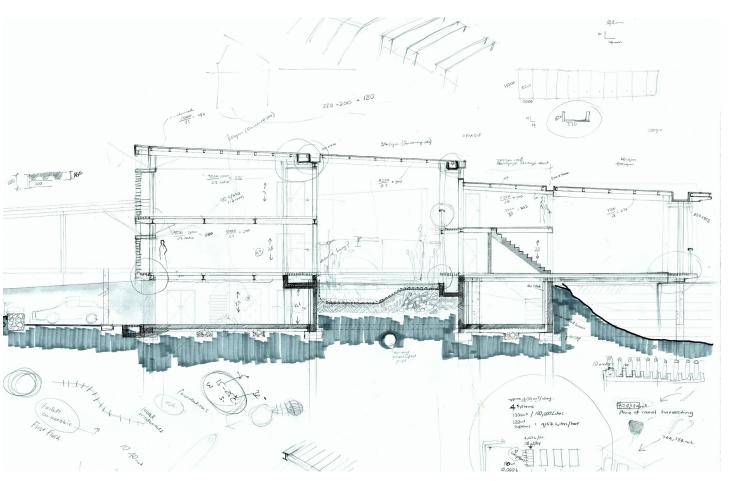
Section with base structure and steel frame. (Author, 2016)
